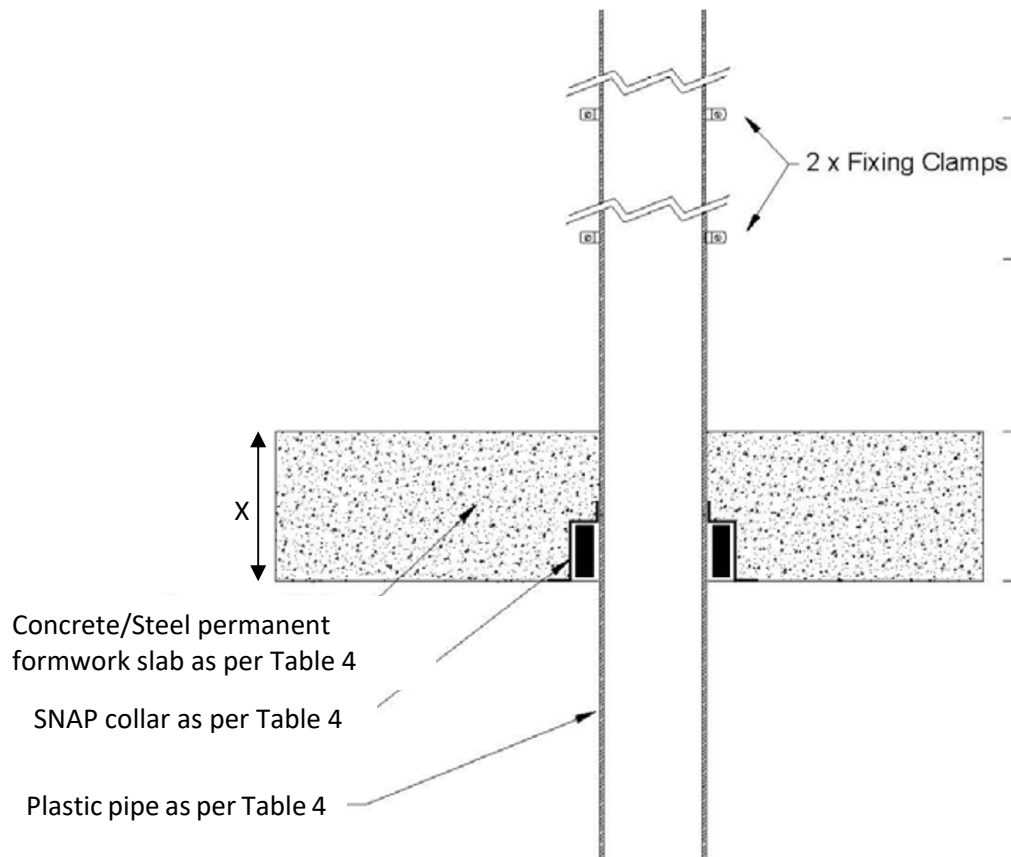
Installation of SNAP Combat collars with stack pipes in concrete slab or concrete with steel permanent formwork slab
